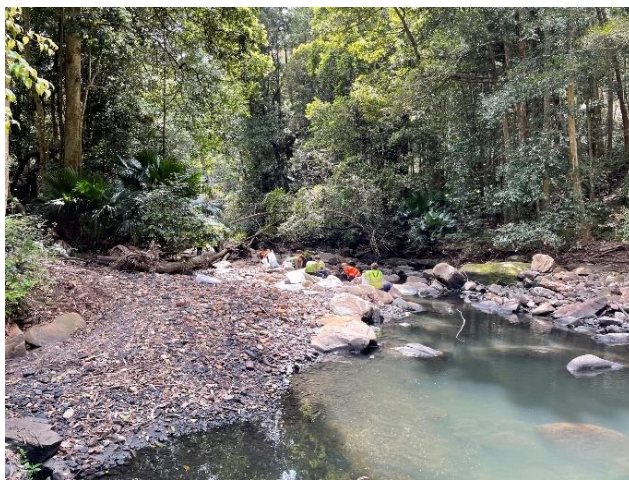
Work crews collecting coal sediment from the exposed embankment downstream of Stormwater Culvert
